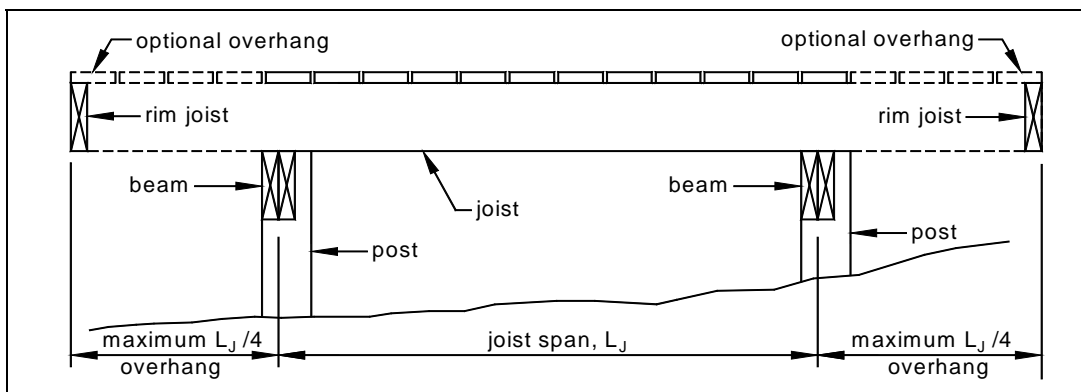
JOIST SPAN - FREE-STANDING DECK
